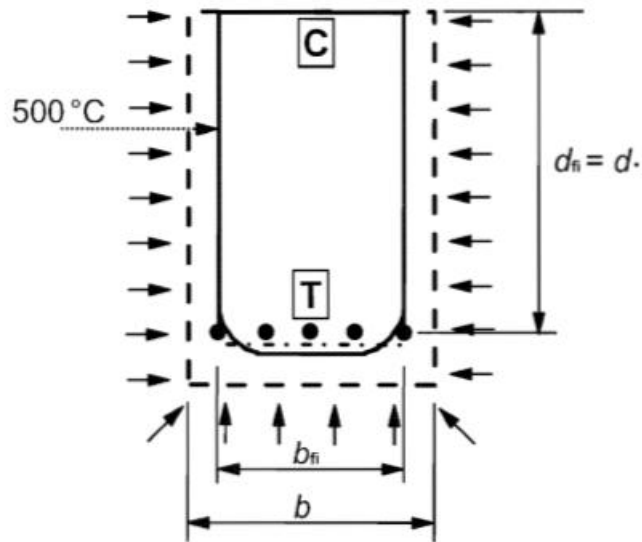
The reduced cross section of beam after spalling. (EC 1992)
